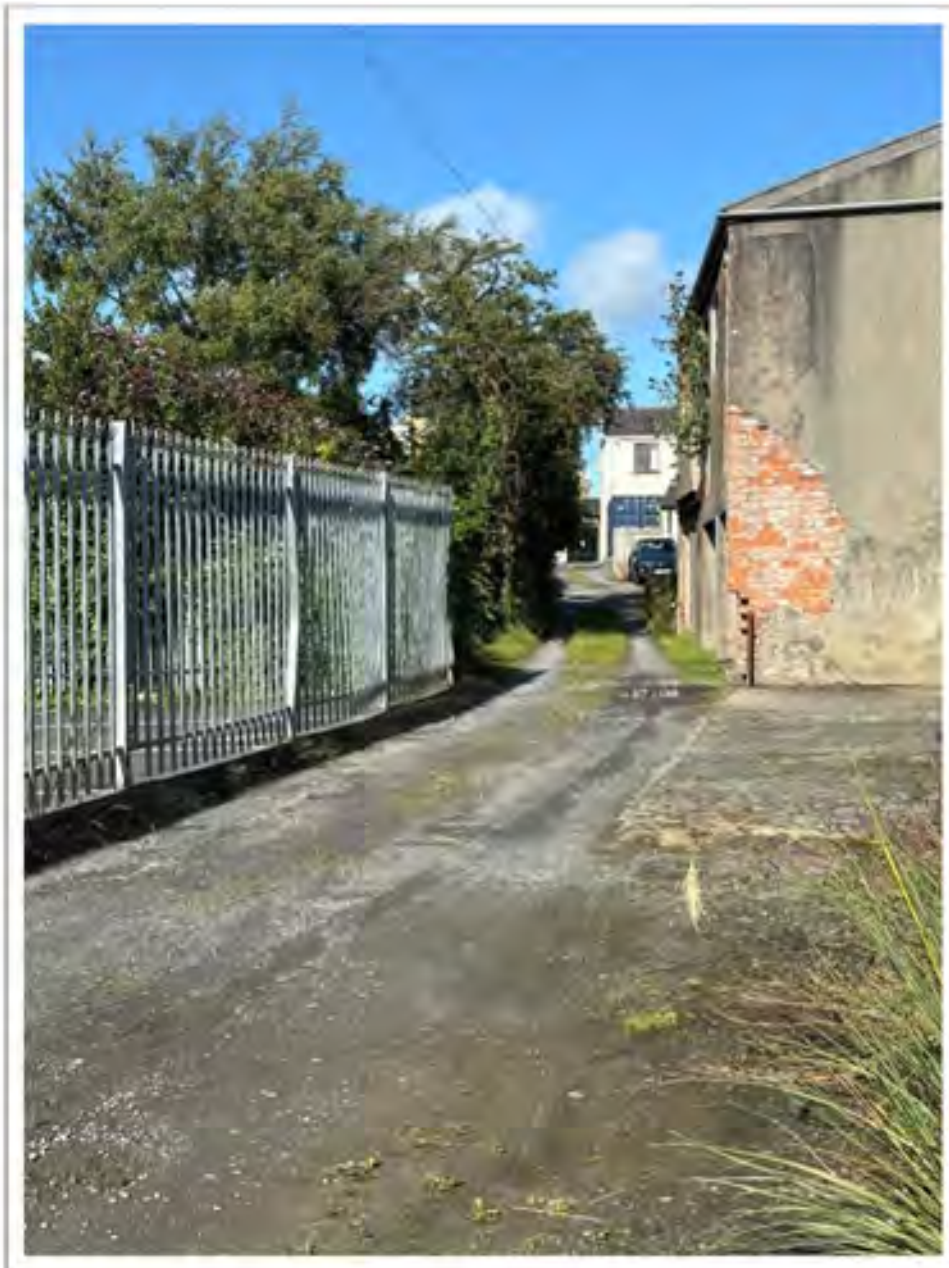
Showing existing shared access lane looking towards Prospect Road (railings of Hamilton Road Presbyterian Car Park, visible on left of photo)
